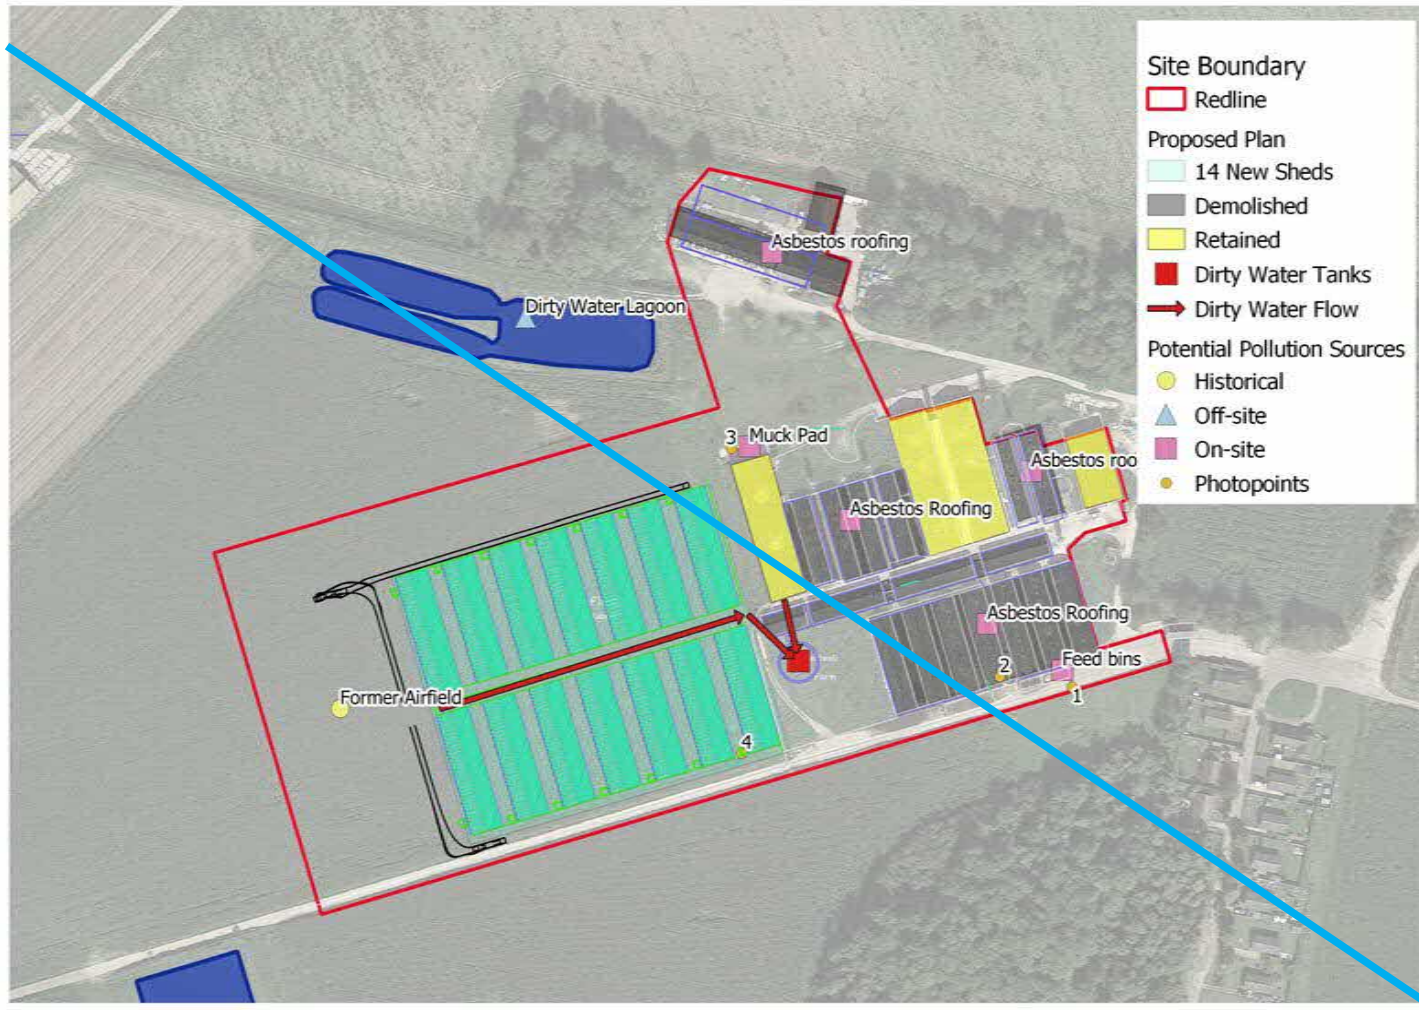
Existing Site Features and Proposed Site Layout for the Proposed Pig Facility and Potential Pollution Sources
